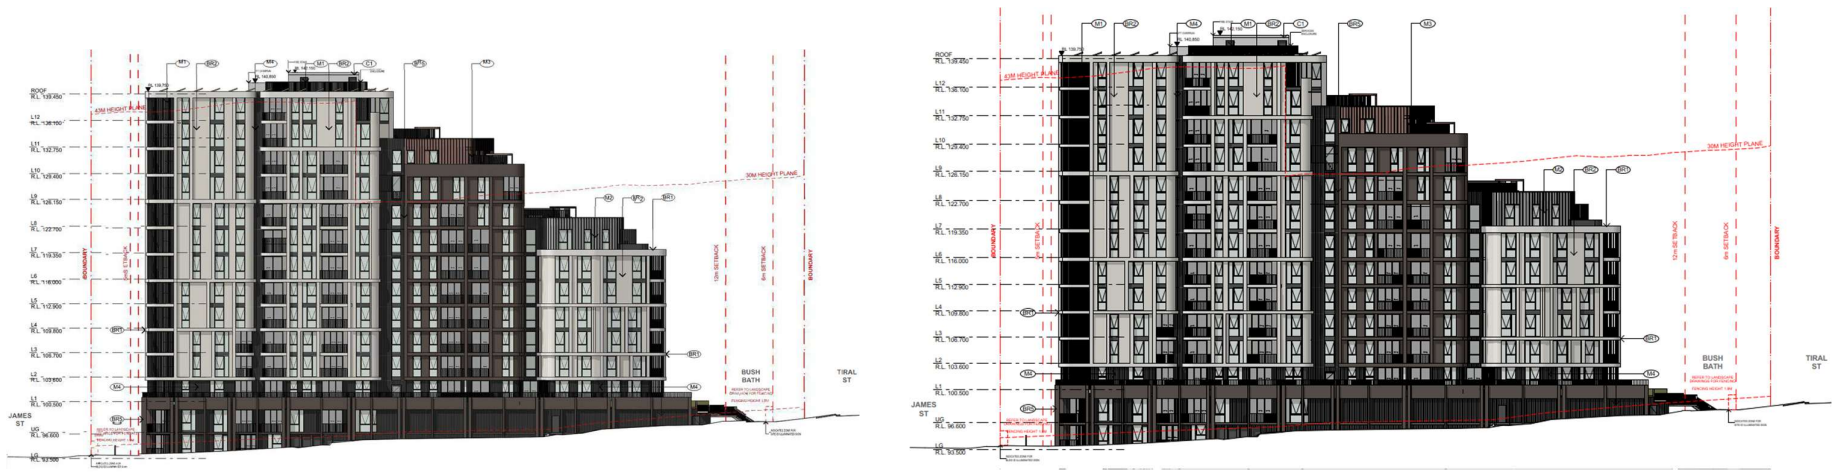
Approved and Proposed West Elevation of Building D (2 of 2)
